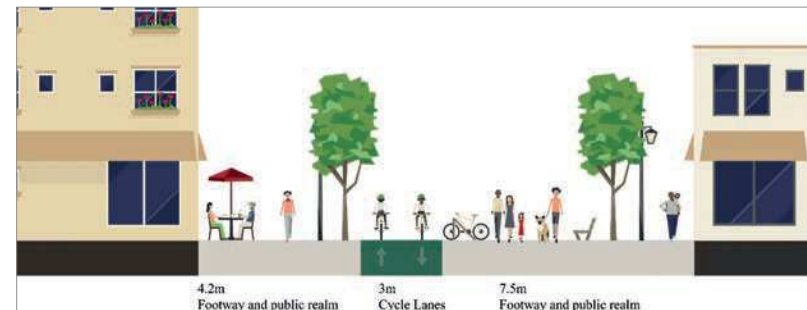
High Street Indicative Proposals (wide cross section) (© Street Mix)
